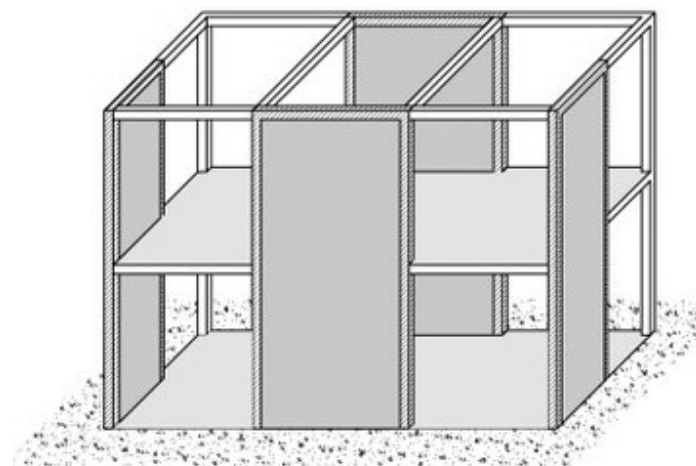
Illustration of shear walls frame system (Rist,V.C.& Swensson S. 2016)
